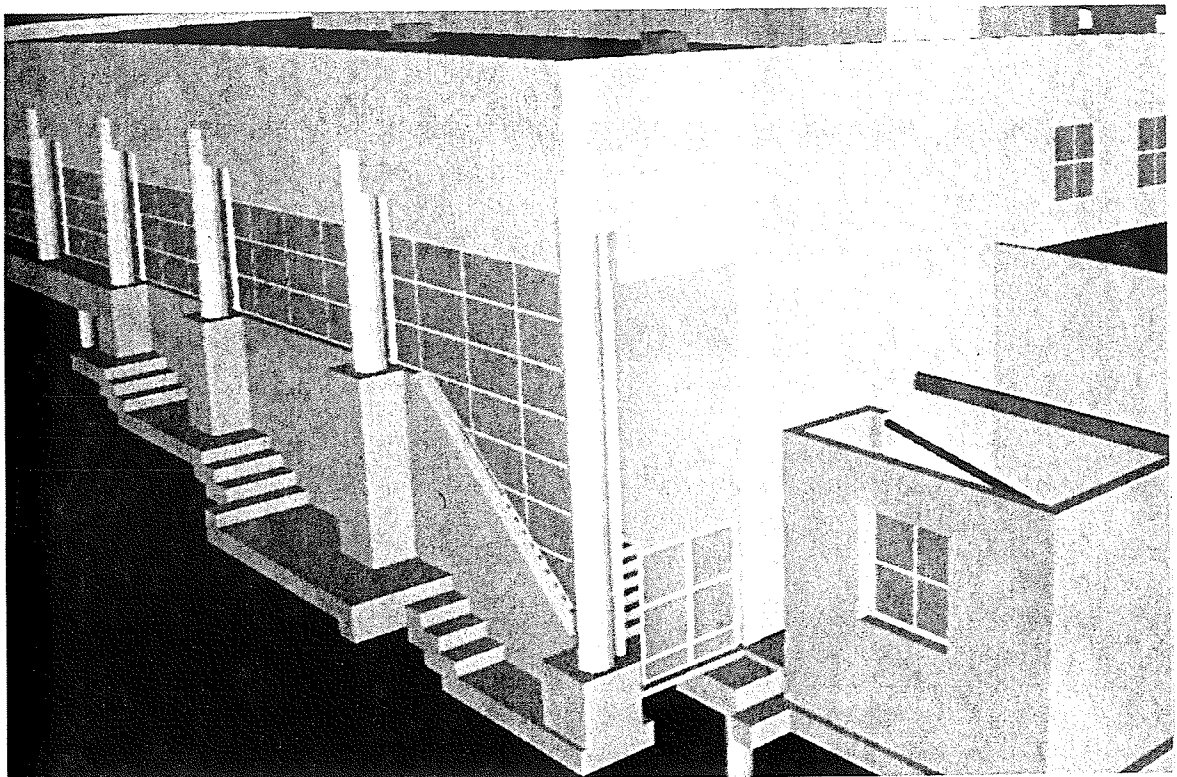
3D model of retaining wall, interpreted from structural engineer's 2D design drawings.
